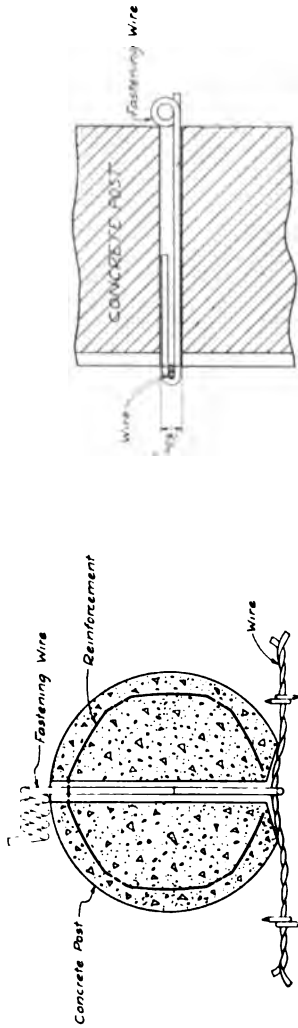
CONCRETE FENCE POST AND METHOD OF FASTENING WIRES.
